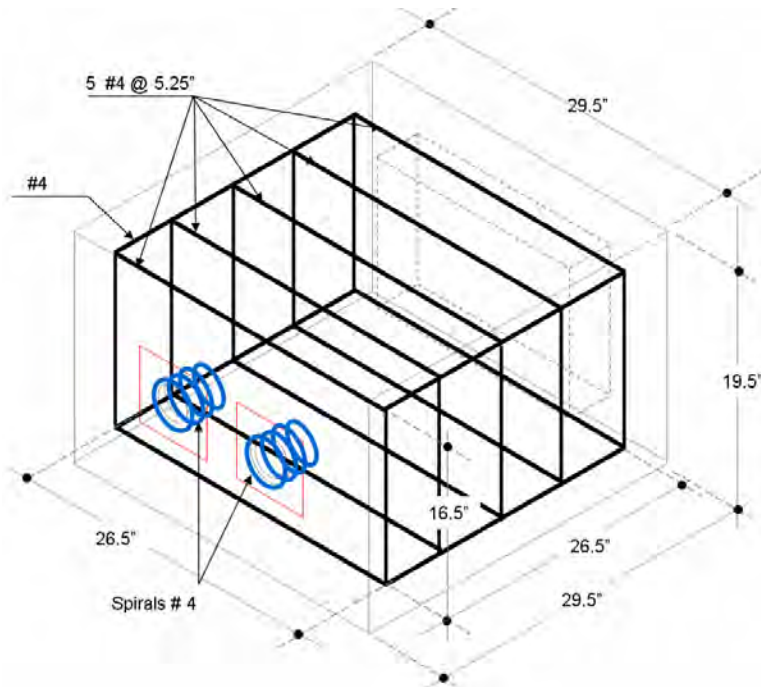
Anchorage Test Specimen Steel Tie Reinforcement.
